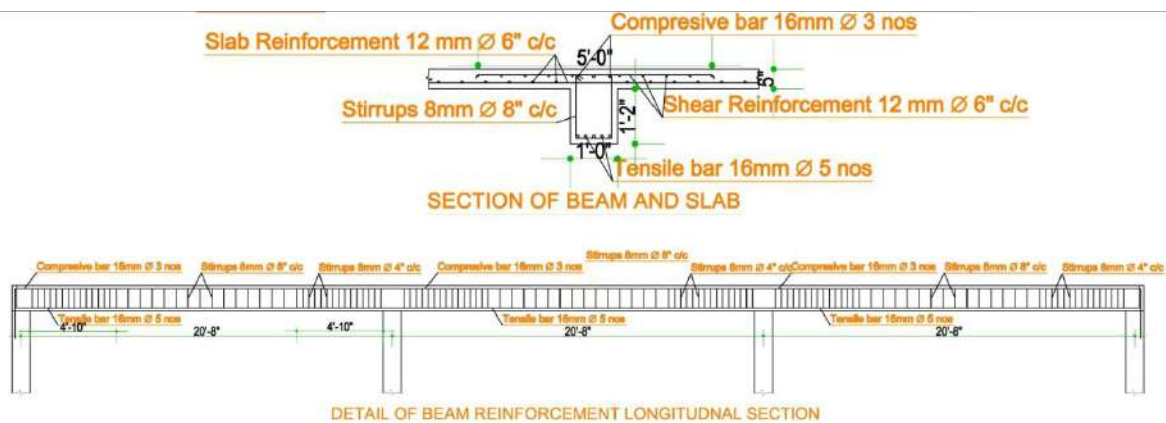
DETAIL OF BEAM SECTION, JALPADEVI HIGH SCHOOL
